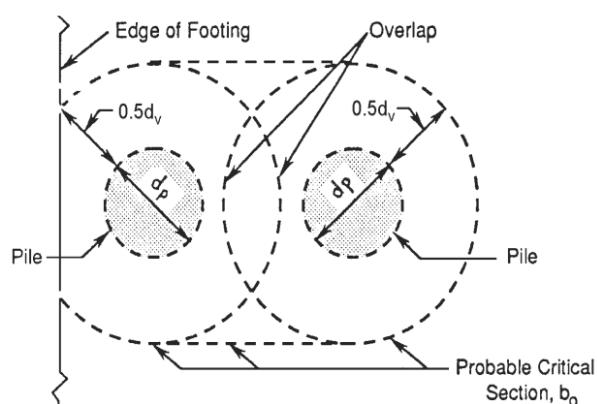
Modified Critical Section for Shear with Overlapping Critical Perimeters
